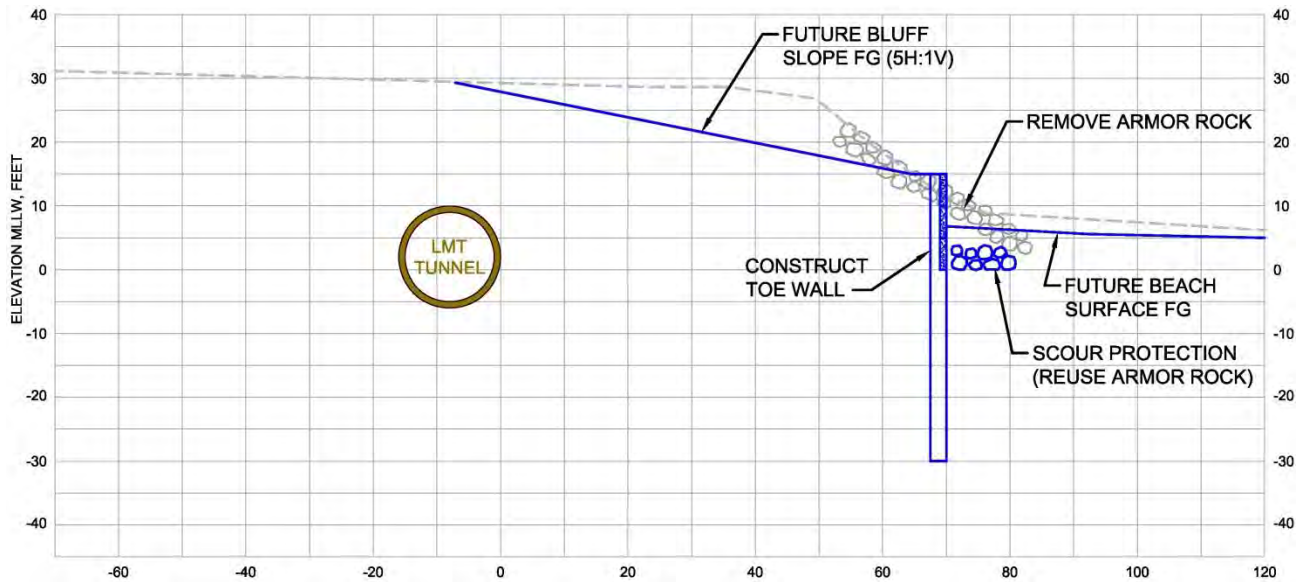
Typical Toe Wall Cross-Section (shown at EQR)
